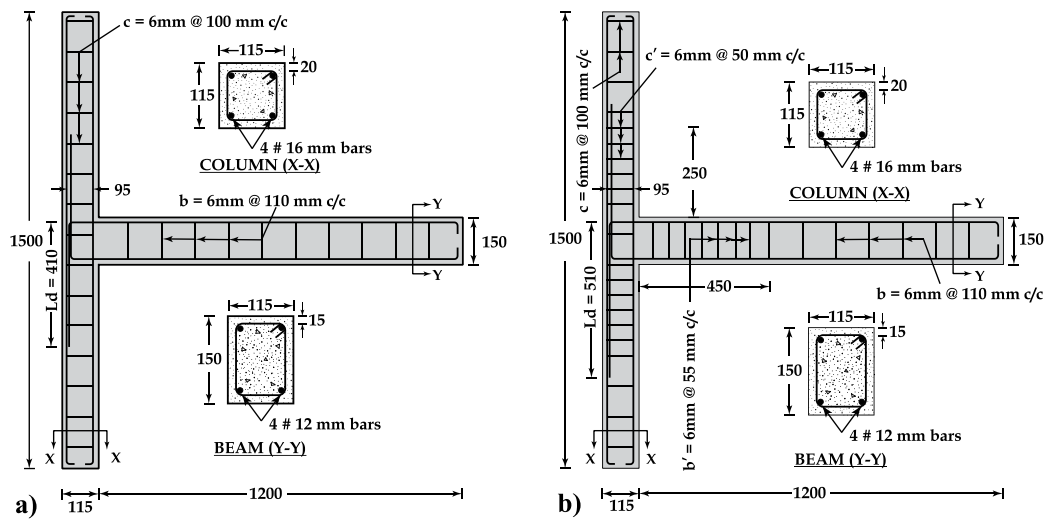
Beam-column joint geometry and reinforcement detailing of: a) BSNS; and b) BSS specimens at half-scale
